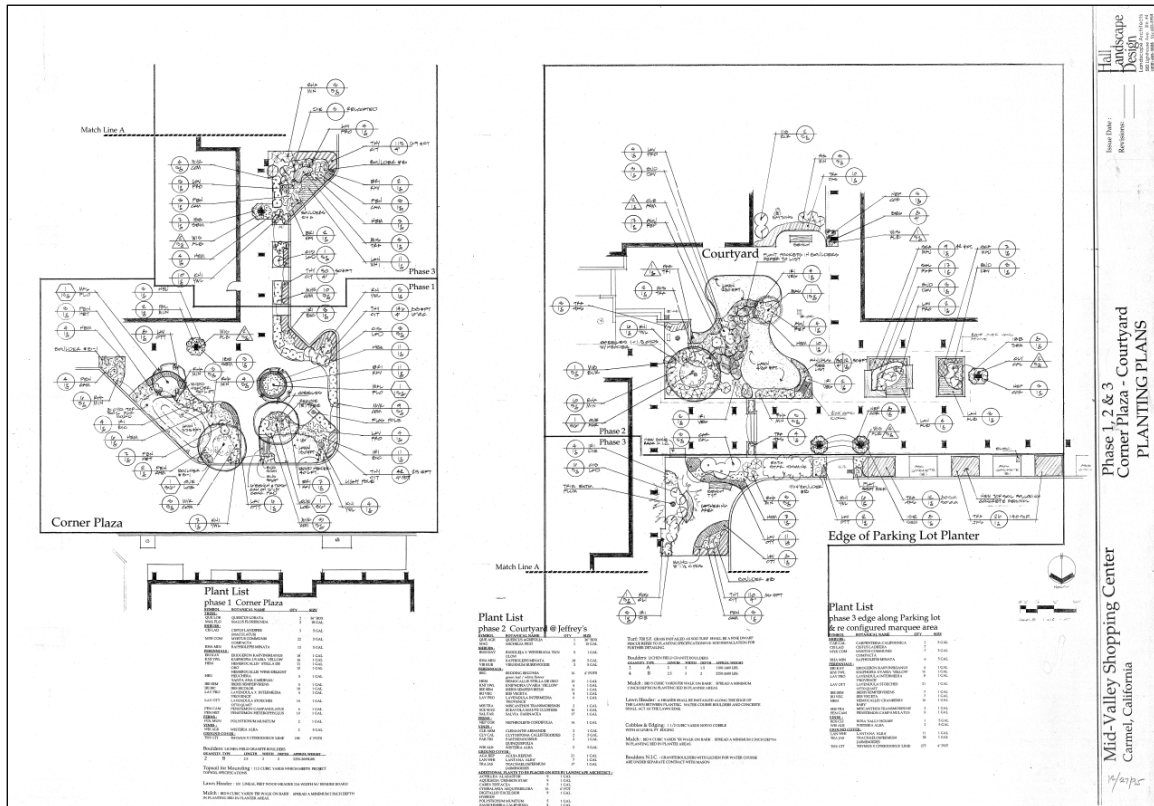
Hall Landscape Design, “Corner Plaza – Courtyard Planting Plans,” 27 December 1995. *Courtesy Property Owner.
